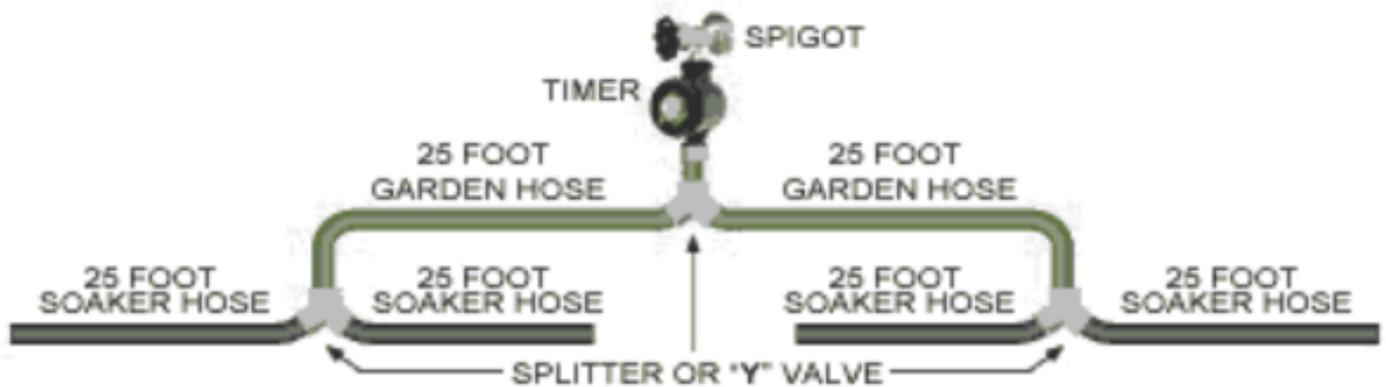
Foundation Watering Soaker Hose System. © ADVANCED FOUNDATION REPAIR
